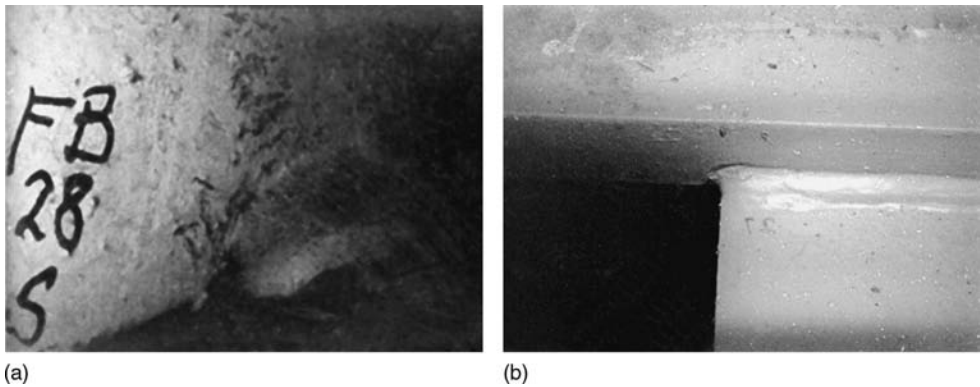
Retrofitting by peening: (a) small fatigue crack at weld toe of gusset plate; (b) crack suppressed by grinding followed by peening.
